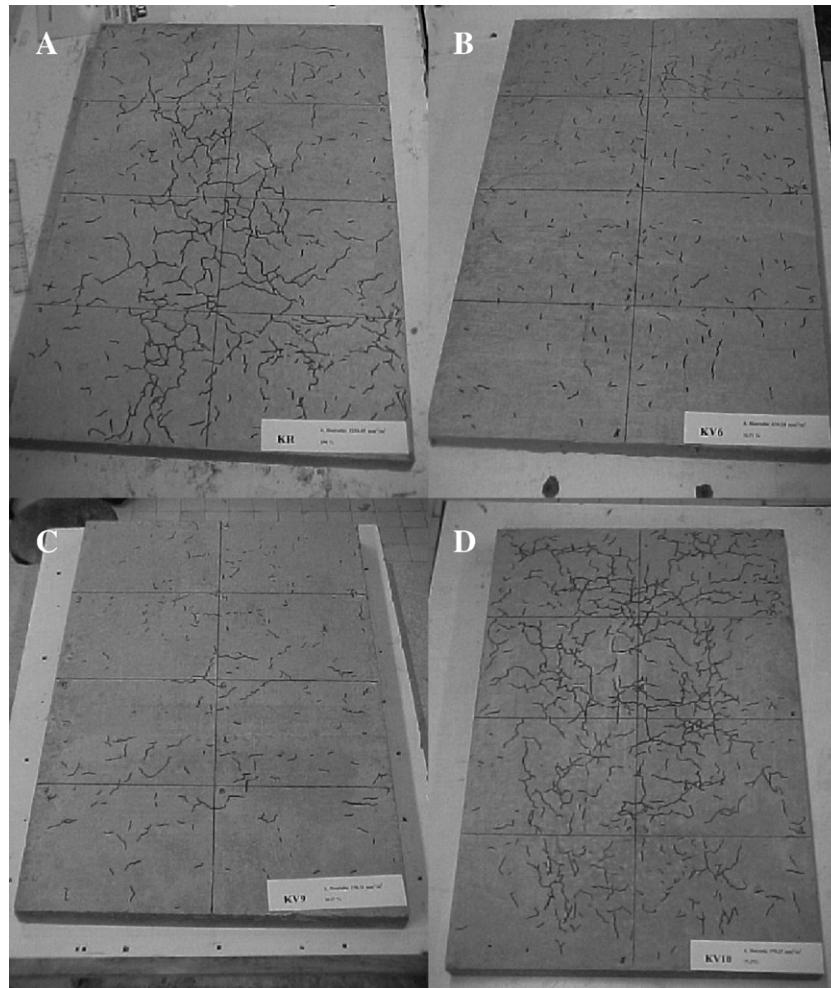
Slab surfaces after the double restrained cracking test. Standard concrete mixtures K: (A) without glass fiber, (B) 600 g/m³, (C) 900 g/m³ and (D) 1000 g/m³. (Cracks have been marked with ink for better viewing).
